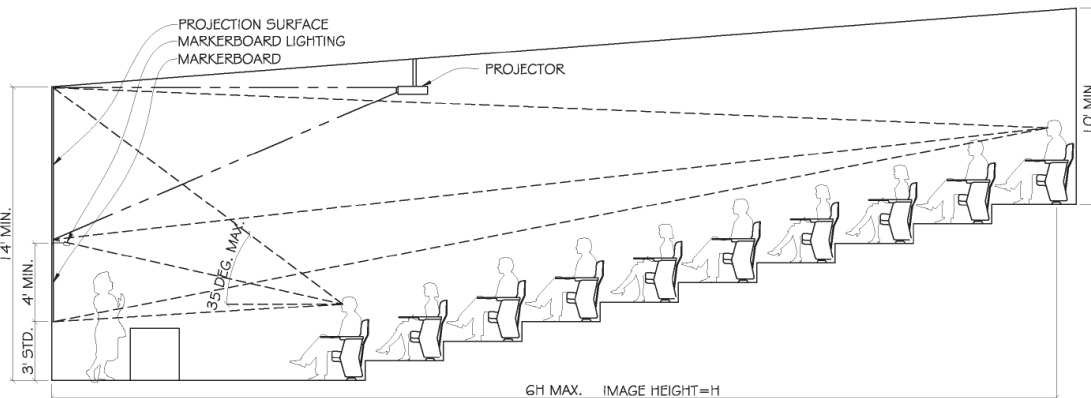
TIERED-FLOOR ROOM SECTION WITH WALL PROJECTION, WITH STANDARD MEASUREMENTS
